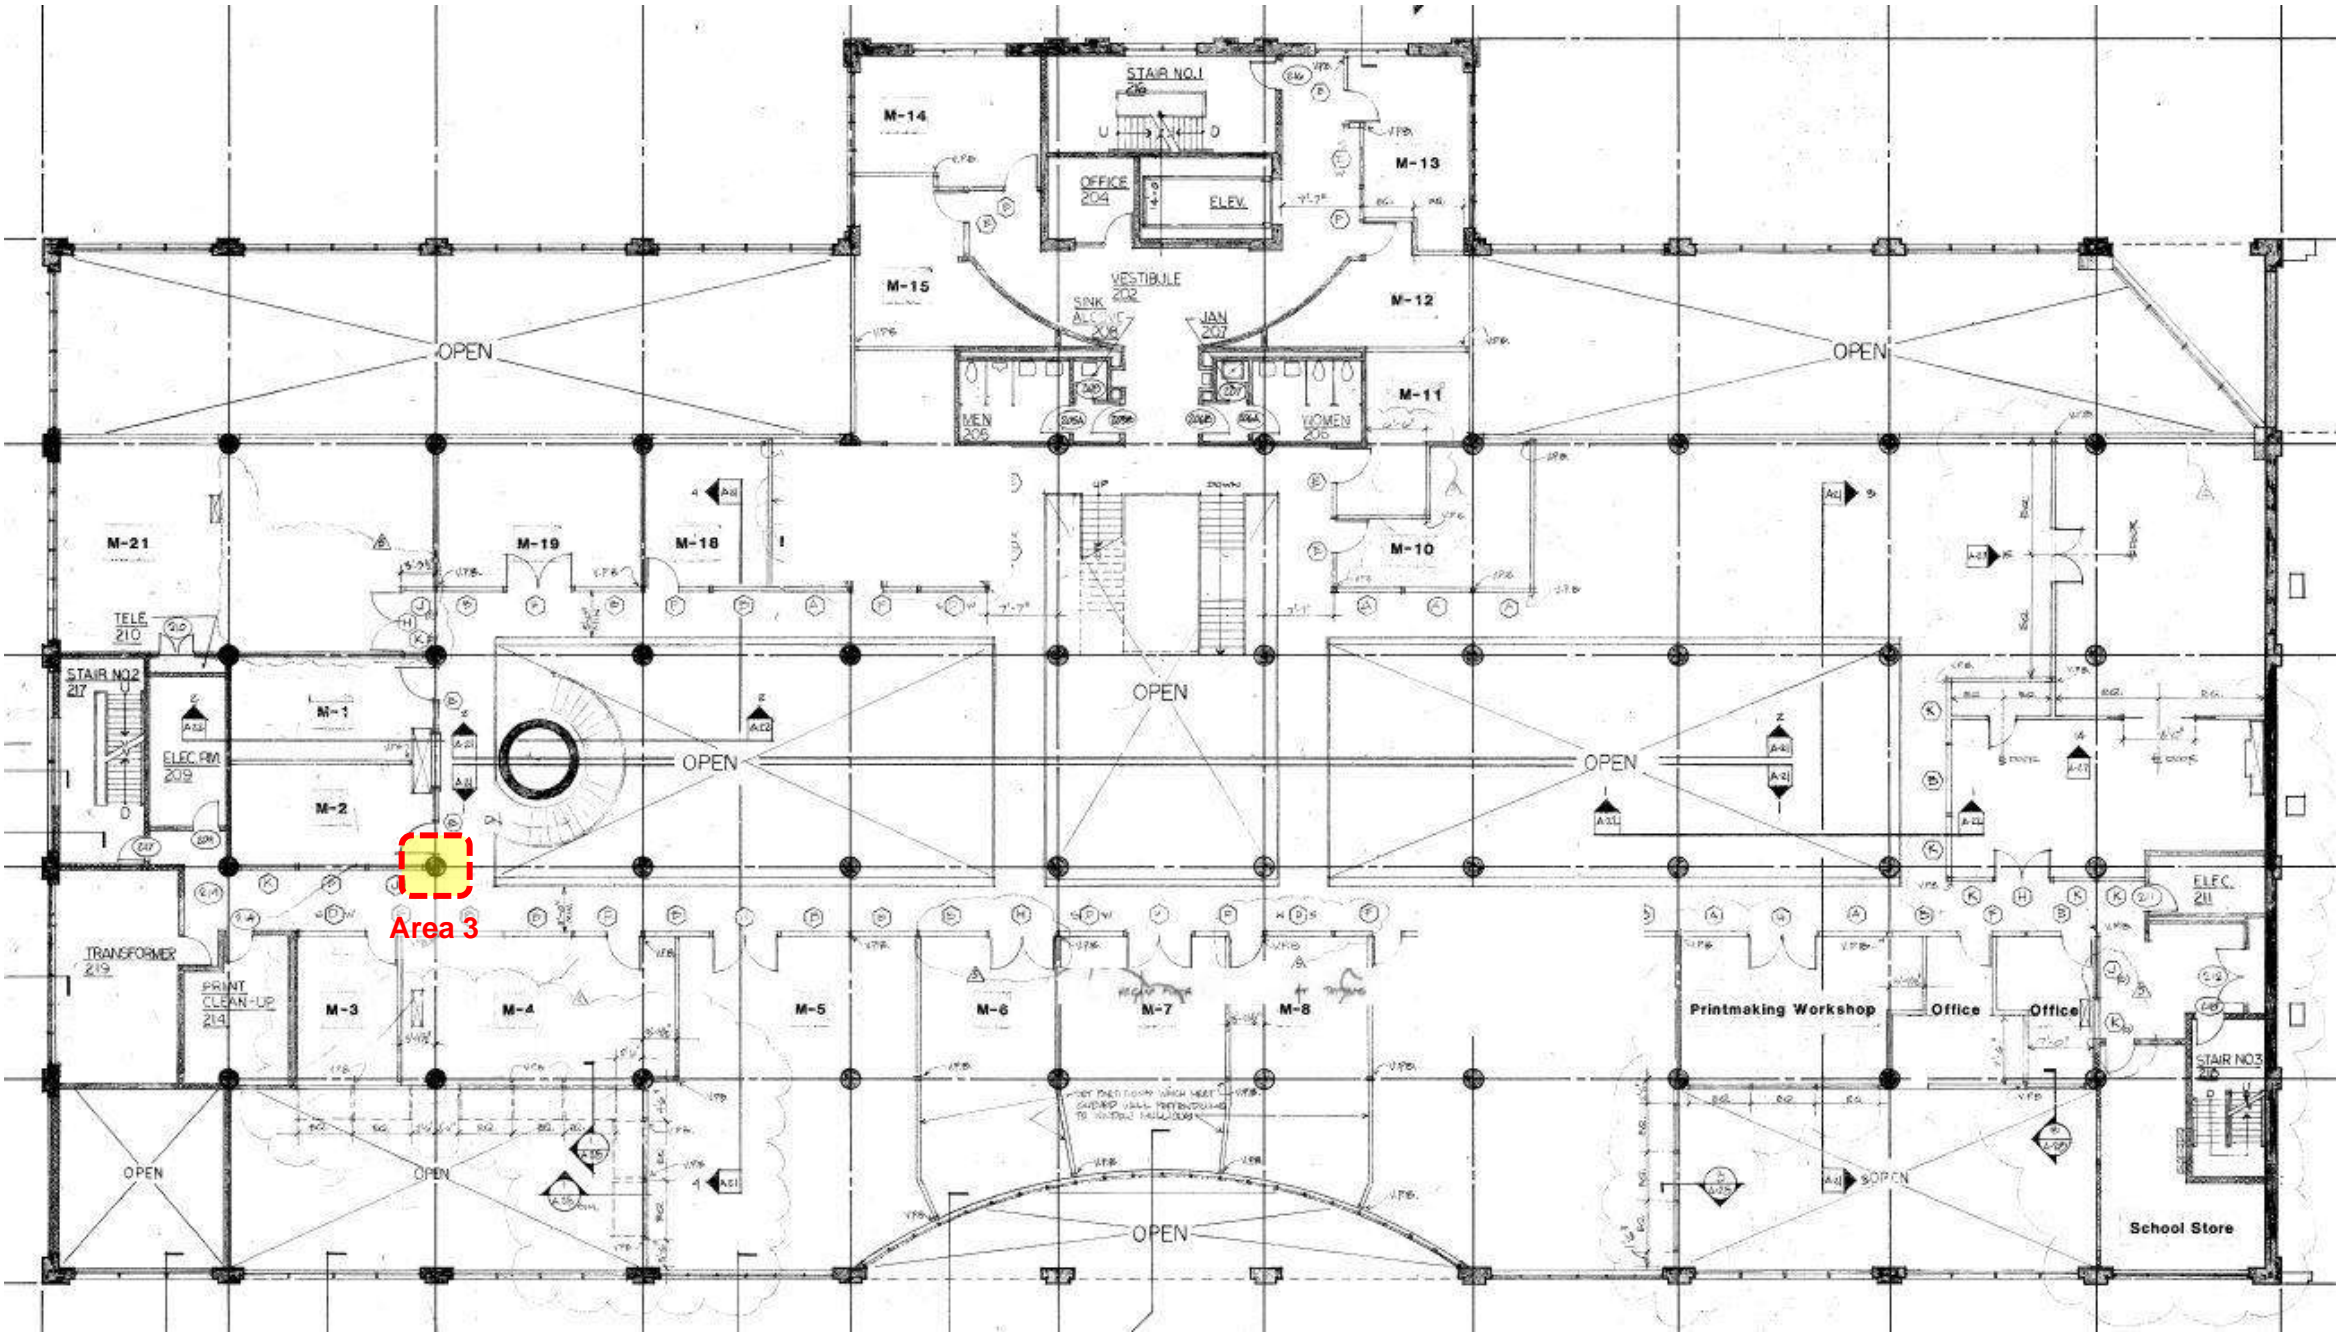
B – MEZZANINE FLOOR PLAN – CBZ AREA 3 (SECOND FLOOR COLUMN HEAD AND ROOF SLAB SOFFIT)
